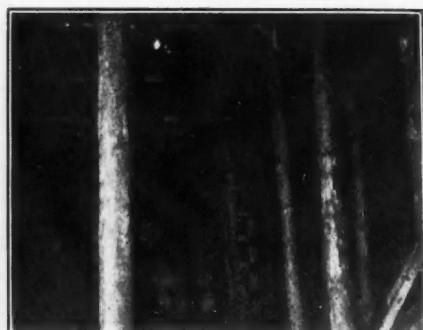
SHOWING WHERE A PILLAR IS REPLACED BY TIMBERING
